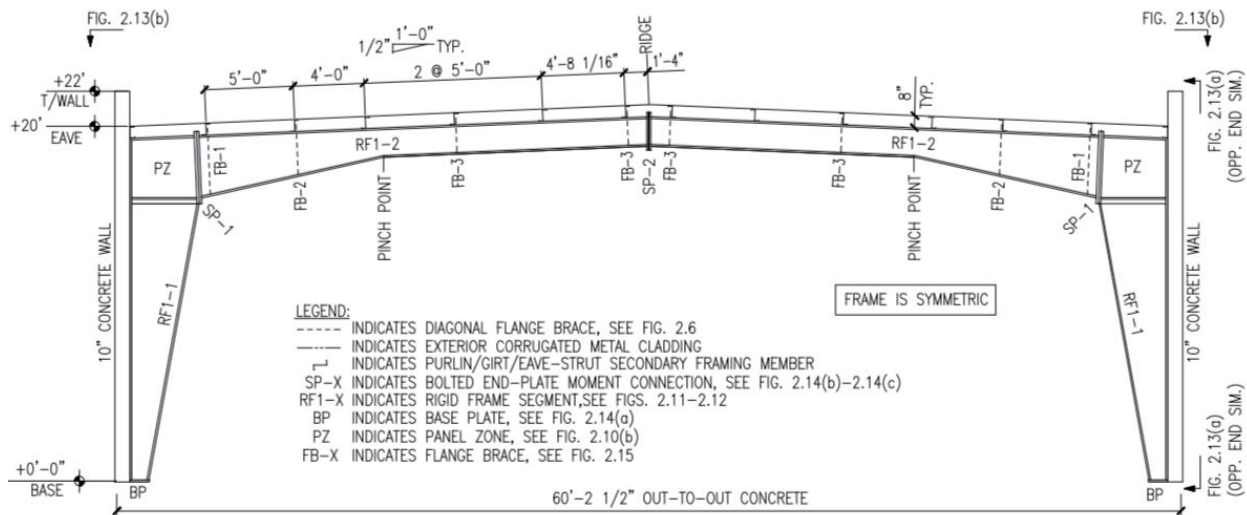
UCSD heavy wall shake table Specimen B2 with two parallel main frames connected with girts, purlins, roof panels, and precast concrete hard walls
